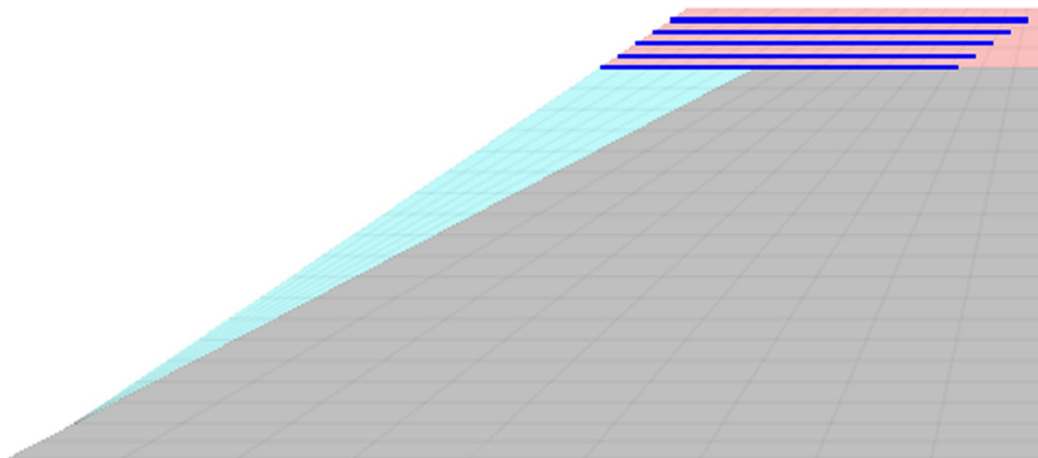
Cross-section of a 3D reinforced model for rotational failure.
